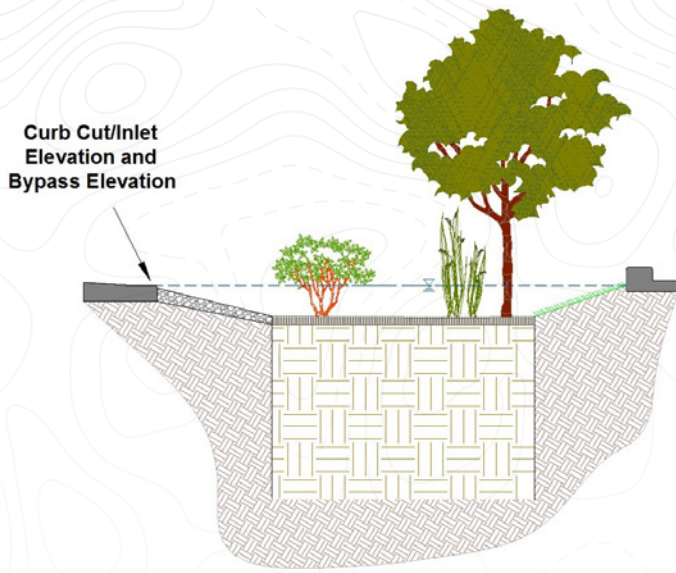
Offline bioretention area where system fills to capacity and excess flow bypasses along curblines at inlet and outlet
